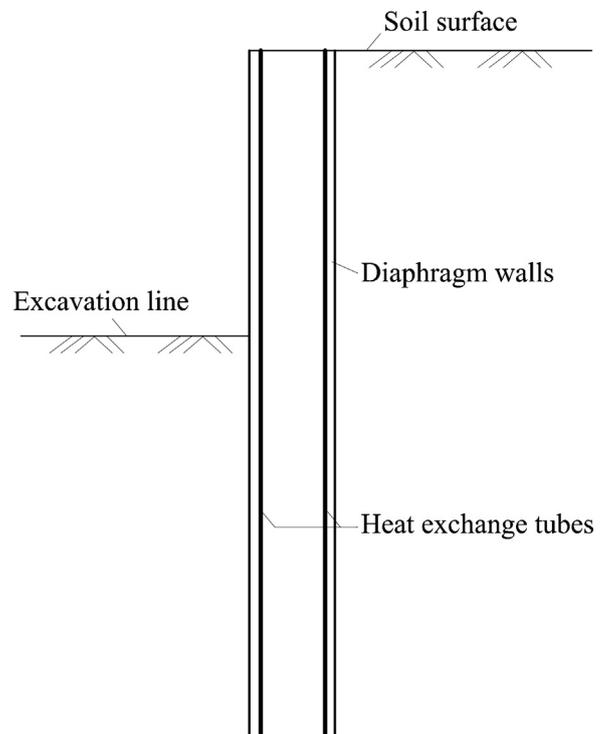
Section plan drawing of geothermal heat exchangers embedded in diaphragm walls.
